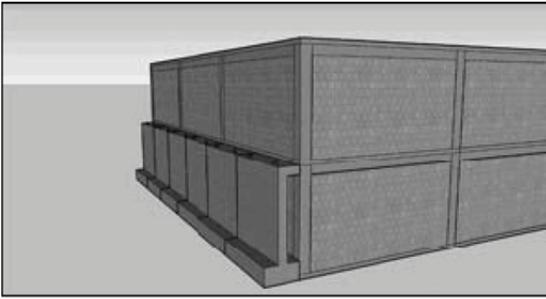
Modular concrete wall, exterior retrofit concept.
